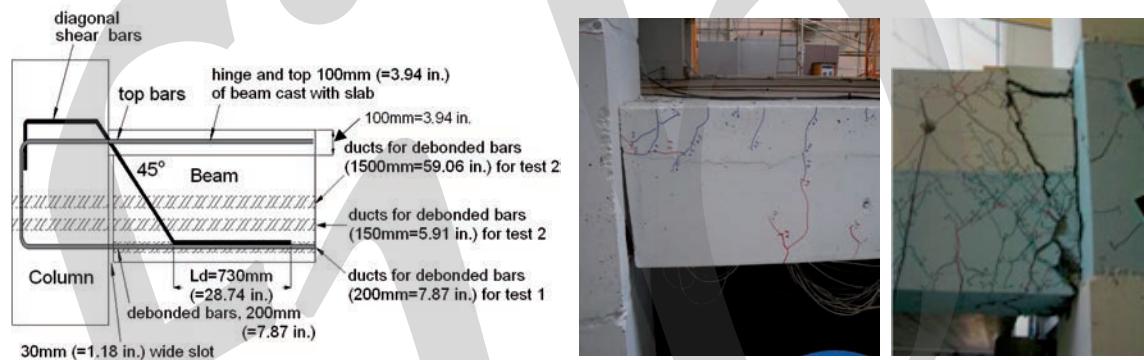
Top-hinge-slotted non-tearing floor system
